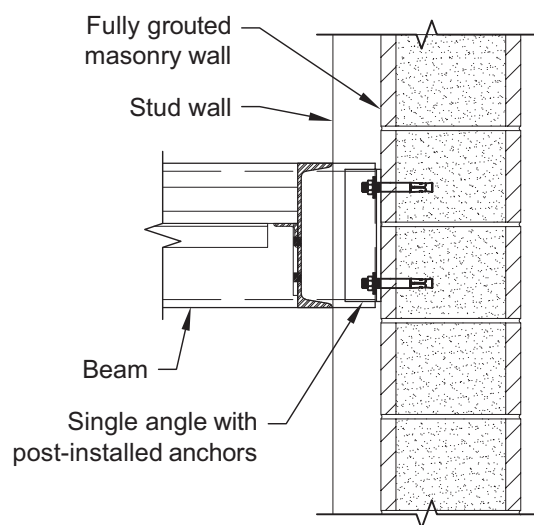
Stair beam single-angle connection using post-installed anchors.
